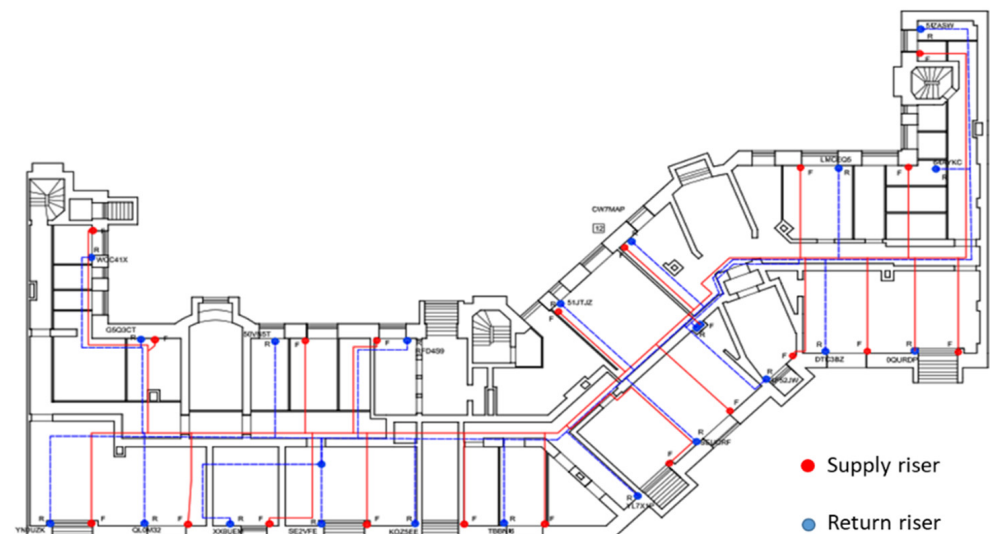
Building A plan and schematic view of the pipelines and risers; temperature sensors are installed on each return riser.
